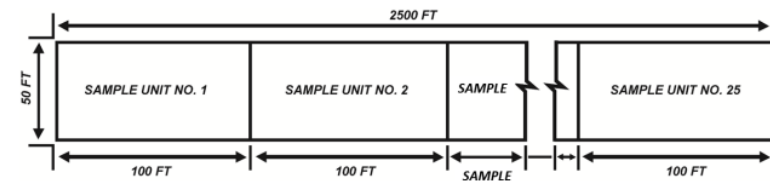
Example Division of a Flexible Pavement Section into Sample Units
